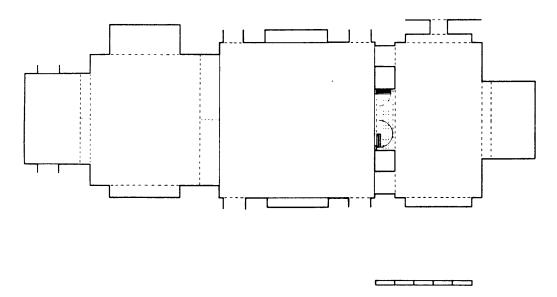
Qā'a of Aḥmad Bey Kohya. Plan (reconstruction).
